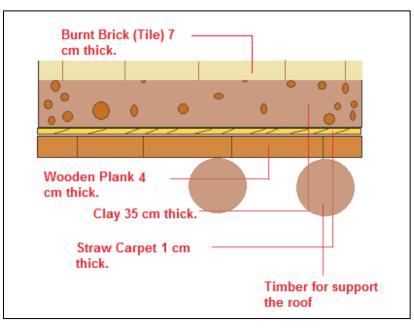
Section in the roof of the house (Kareim, 2018)
